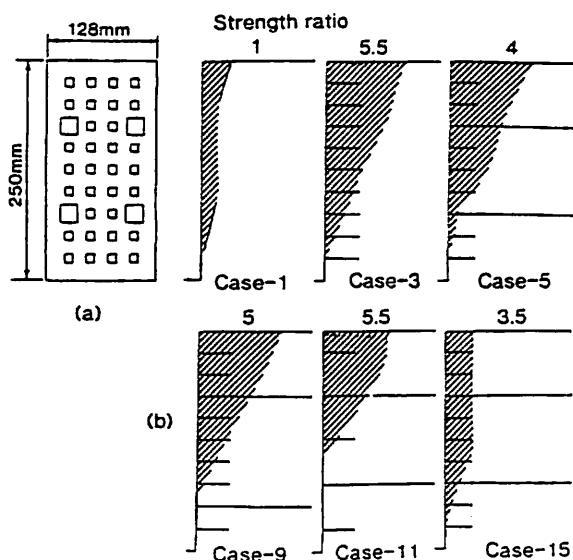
Centrifuge tests of sand walls reinforced with steel bars; (a) model dimensions, and (b) the failure pattern (the numerals means the ratio of the failure acceleration to that for the unreinforced wall of Case 1, and the shaded zones indicate the failed zones) (Sonomura et al., 1991).
